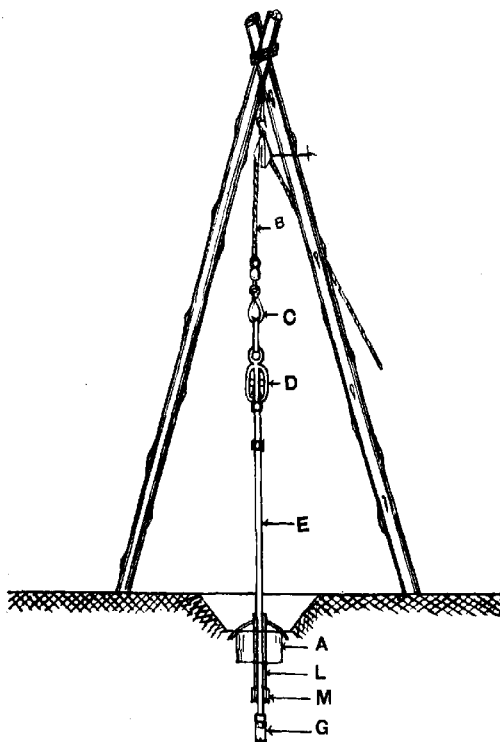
(B) Sinking rope. (C) Swivel hook. (D) Martin's sludger. (E) Boring rod which is hollow in this case. (A) Guide drum. (L) Casing or boring tube. (M) Cutting shoe. (G) Boring tool.
